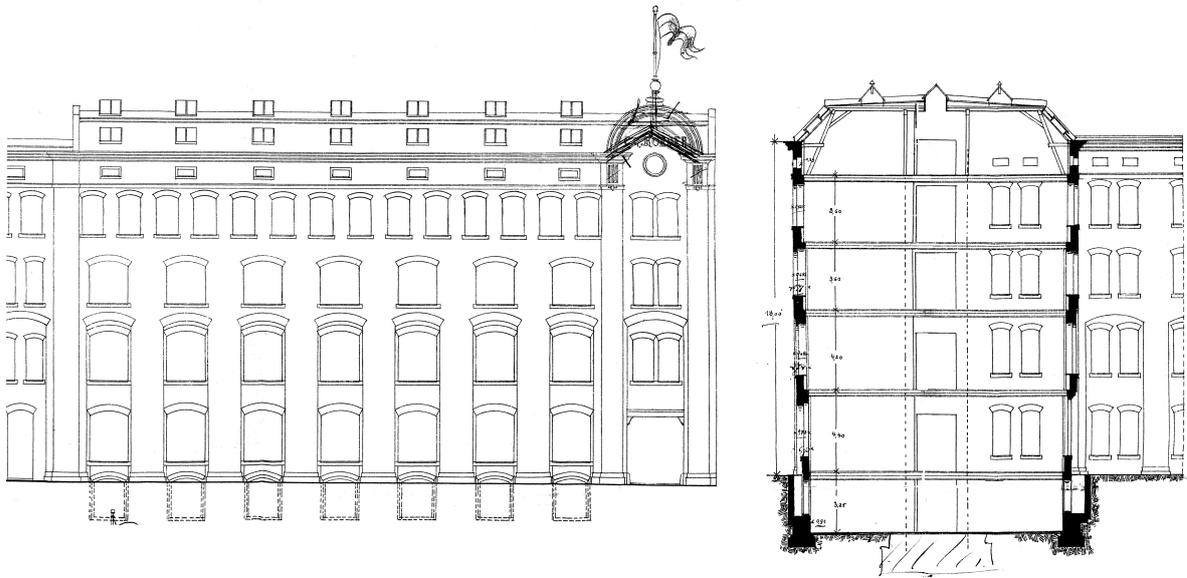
Executed design for the façade and cross-section showing no details of the Hennebique-construction, submitted in April 1898; (Bauakte, p. 120)
